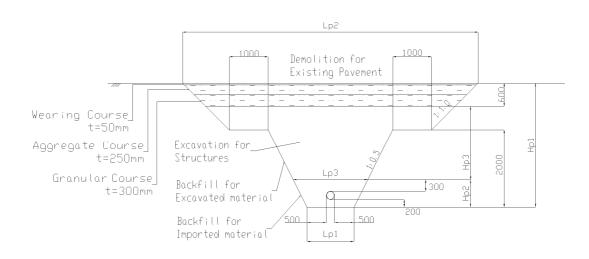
Standard Cross Section of Excavation for Sewer Network
